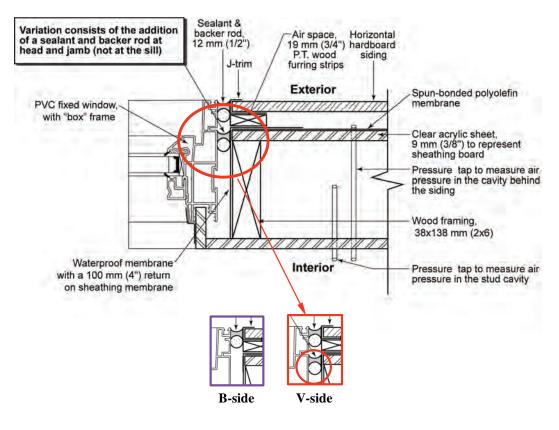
Horizontal sectional views of Specimen W1 showing the wall-window interface at the jamb for the Variation (V-side) and selected practice (B-side; base-case) specimen configurations. The difference between the B- and V-sides is that the B-side has a single joint seal whereas the V-side included an additional sealant and backer rod at the interface at the head and jamb (not sill) of the window.
